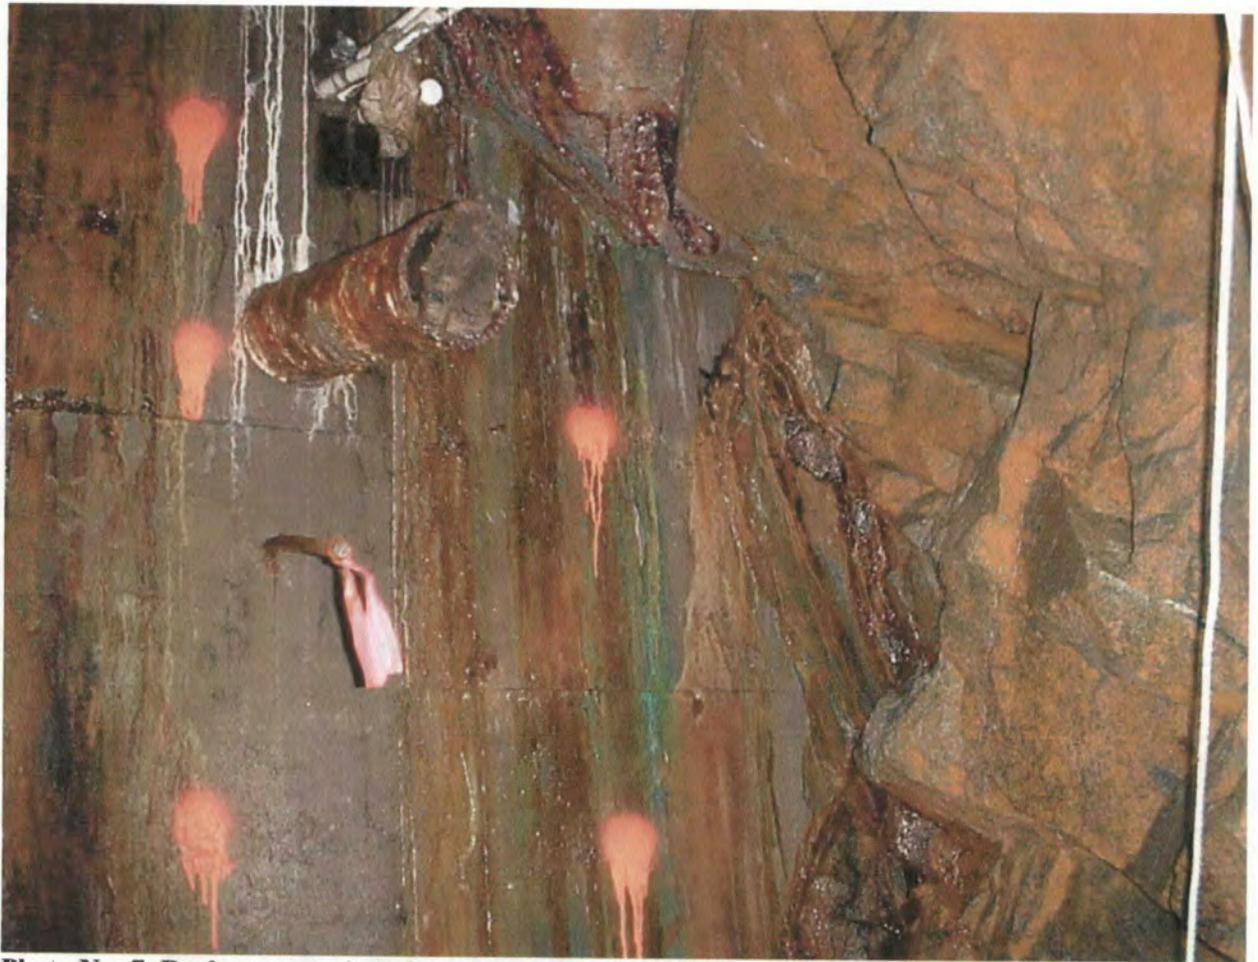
Upper right quadrant showing the original concrete pumping pipe stub.
